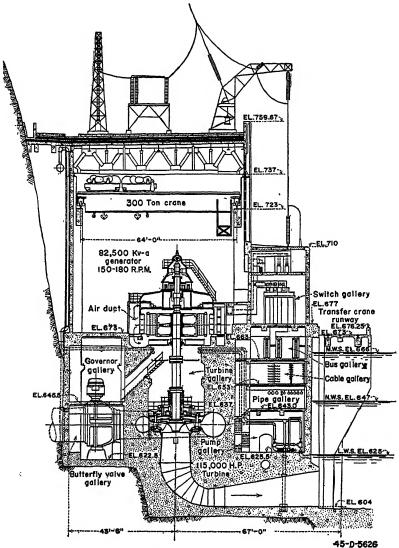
Boulder Dam. Cross section through left wing of power house. (U. S. Bureau of Reclamation.)
